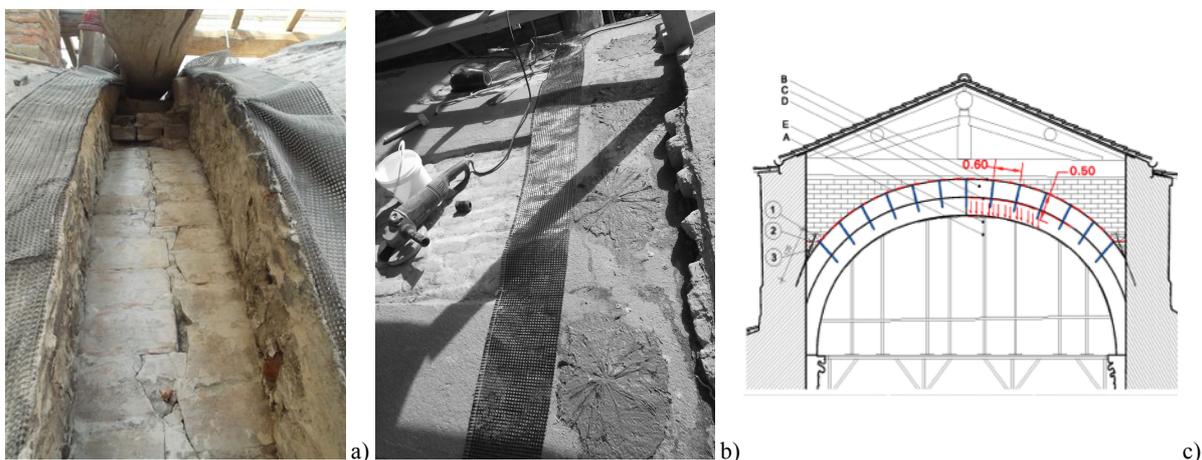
St. Bassiano church main arch between the nave and the apse: a) reinforcement with FRCM; b) and c) connection joints with masonry arch and lateral walls
